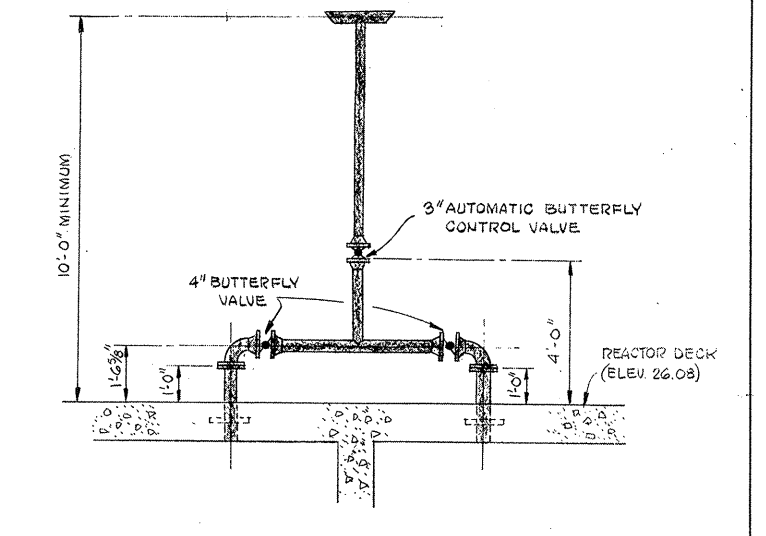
SCALE: 3/4"=1'-0"
